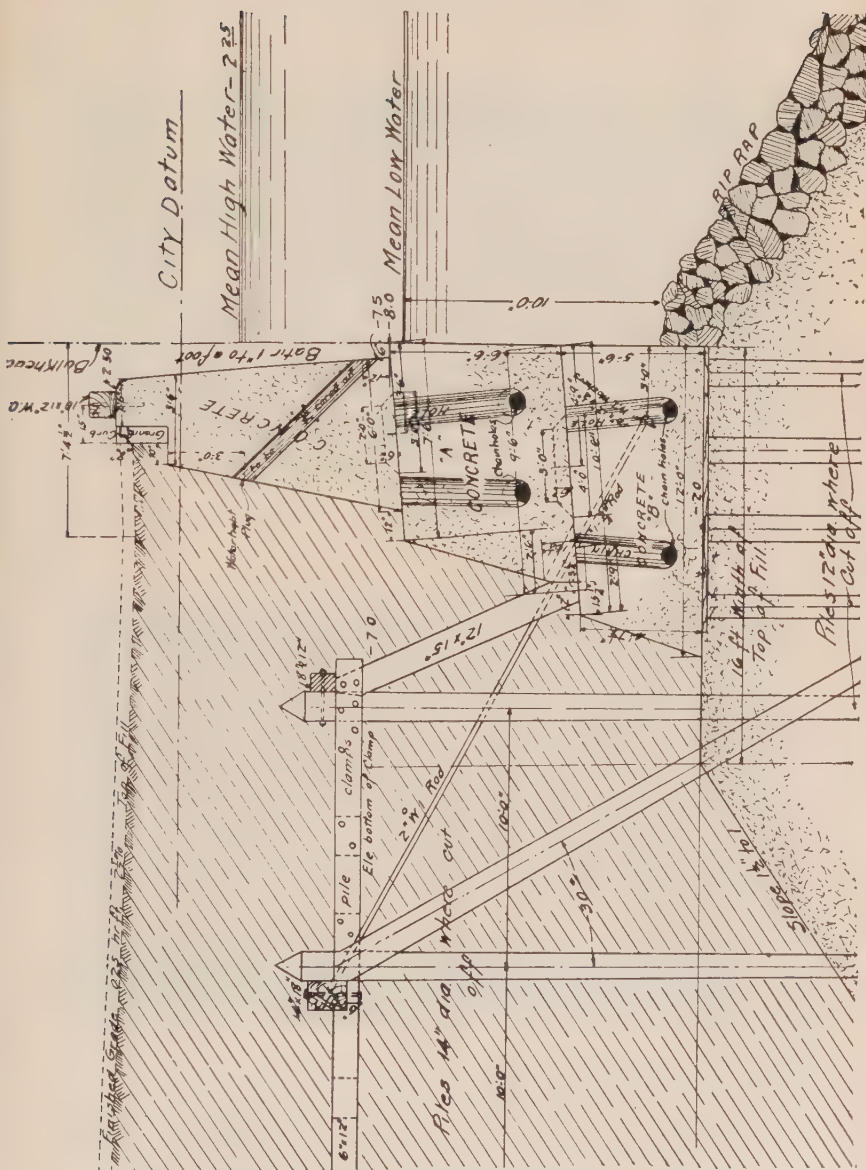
GENERAL CONCRETE SECTION OF DELAWARE AVENUE BULKHEAD FROM VINE TO SOUTH STREETS, PHILADELPHIA, PA.
